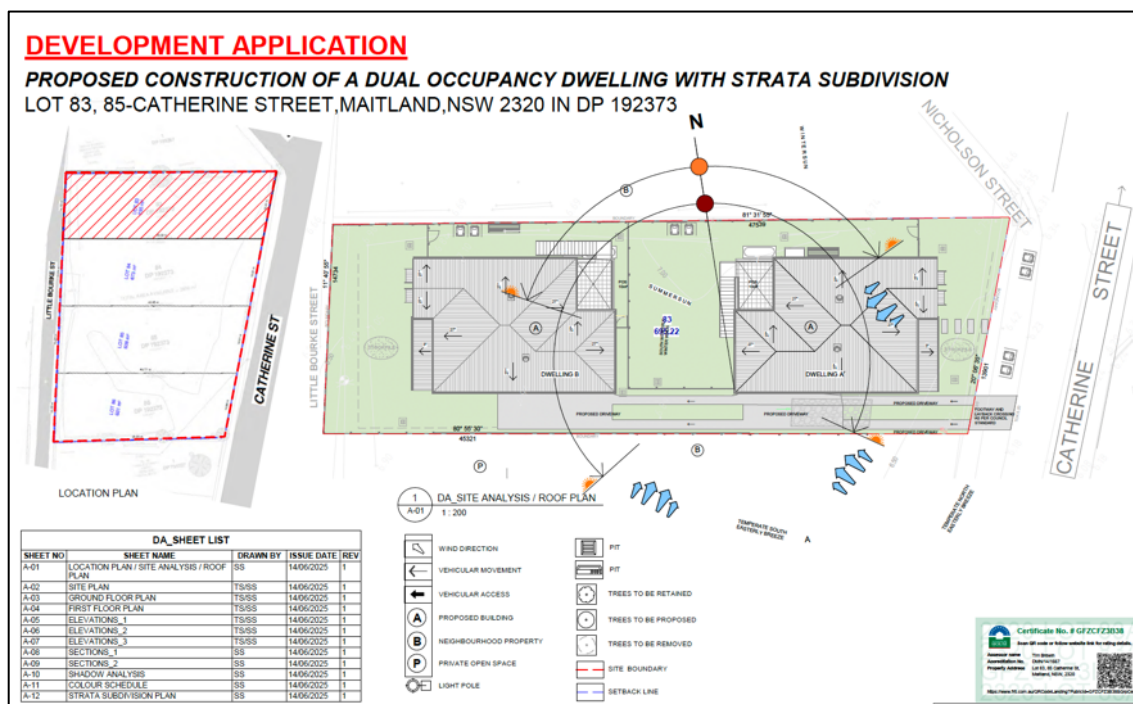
Lot 83 – Location Plan and DA Site Analysis/ Roof Plan
